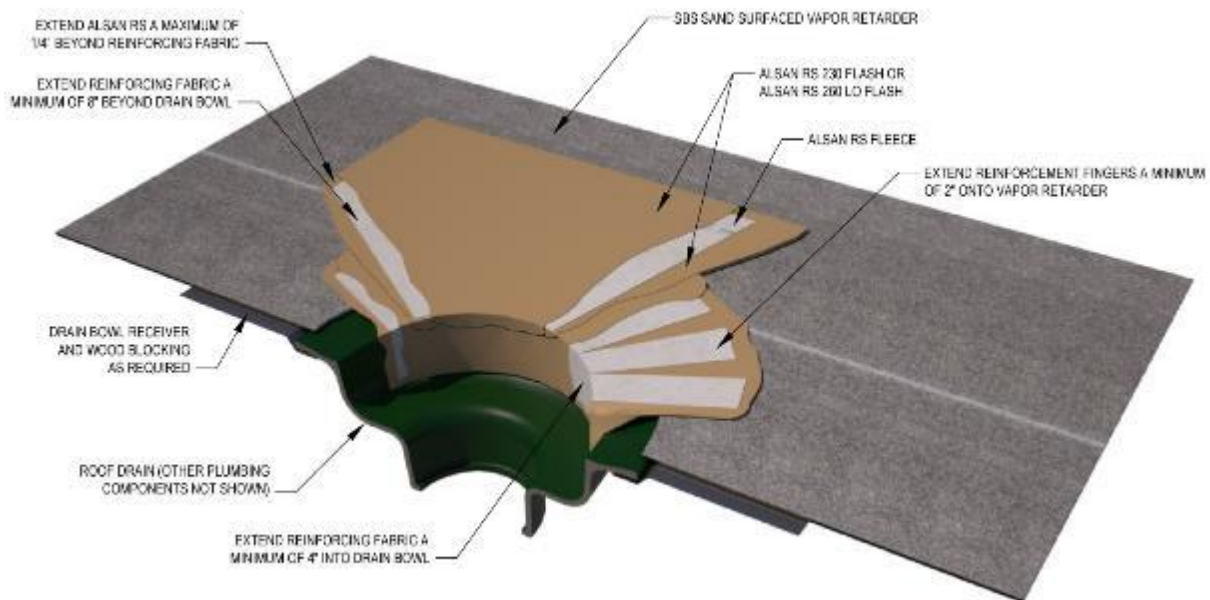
ALSAN® RS Roof Drain Flashing on Vapor Retarder
